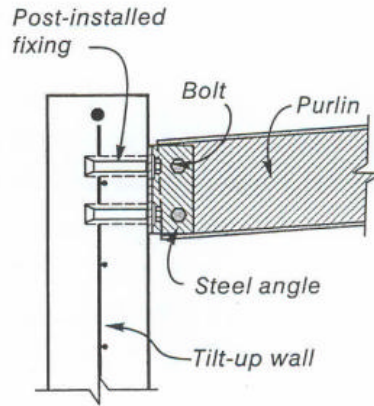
Typical connection detail between end wall and steel purlin (Restrepo *et al.*, 1996)
